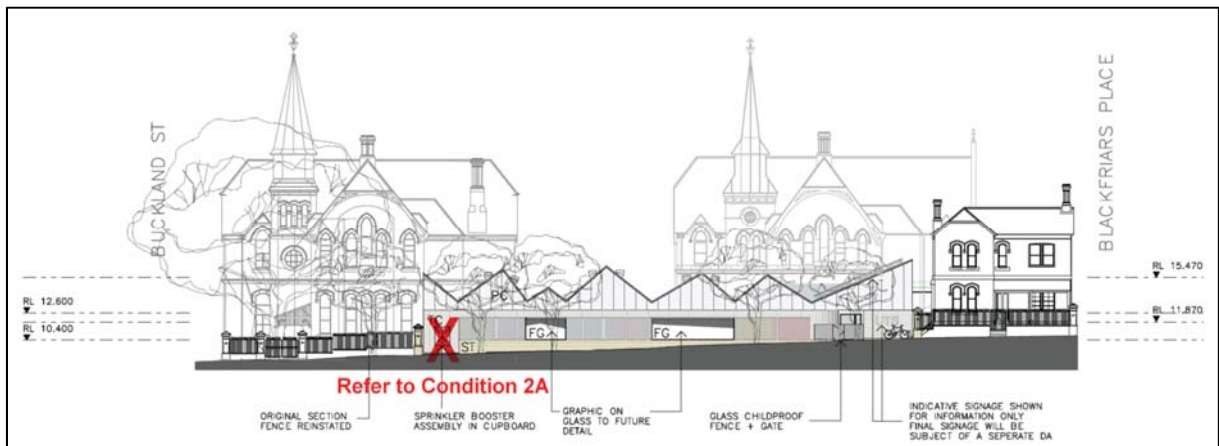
Former Girl's School building (CB22) (source: DPE)
